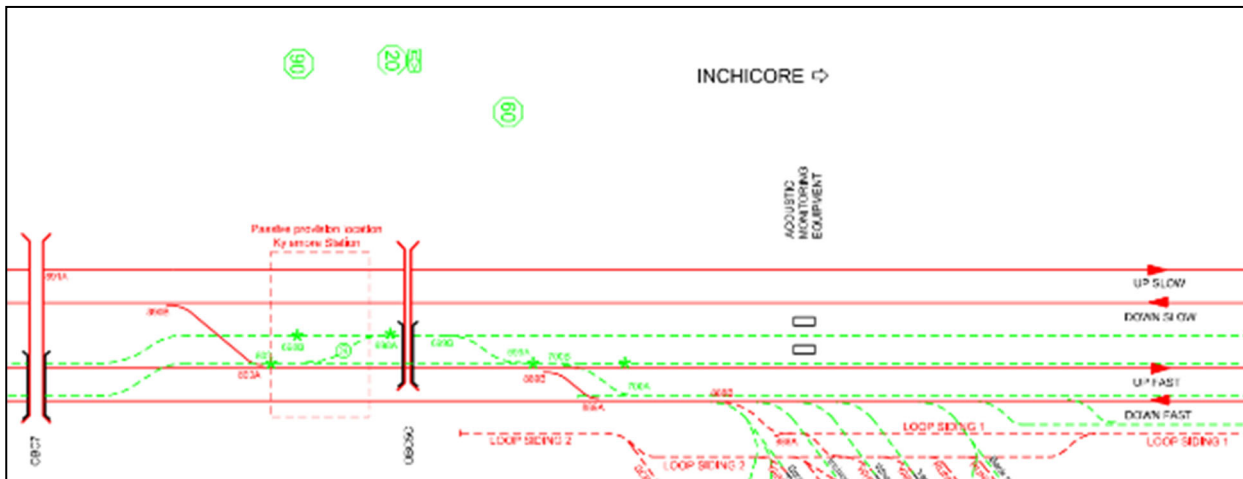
Le Fanu Road Bridge (OBC7) to Kylemore Road Bridge (OBC5A) Track Plan Layout
